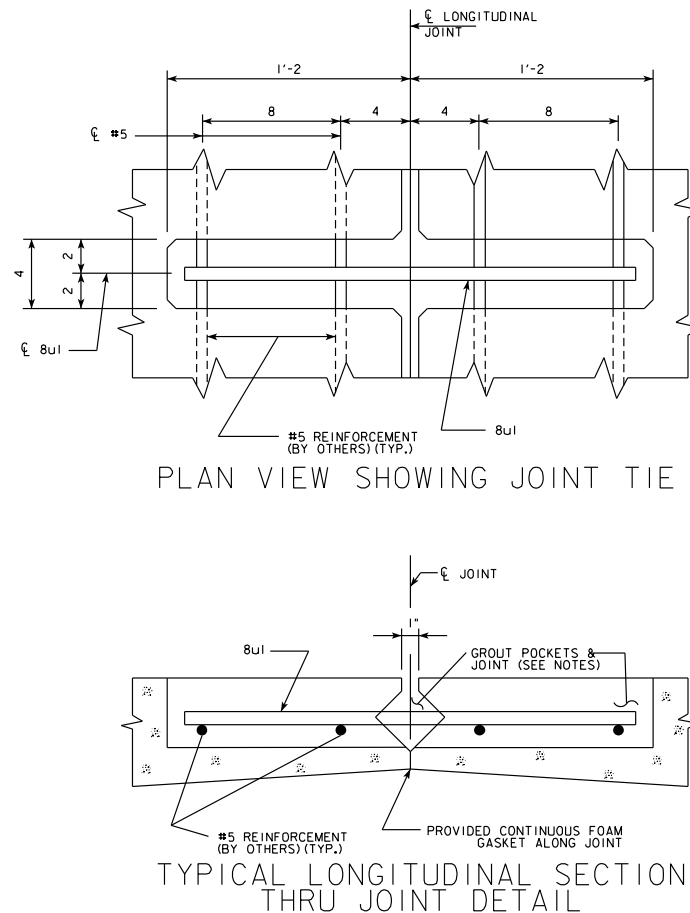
Slab Connection between adjacent Pi girders tested at Turner Fairbank Laboratory
